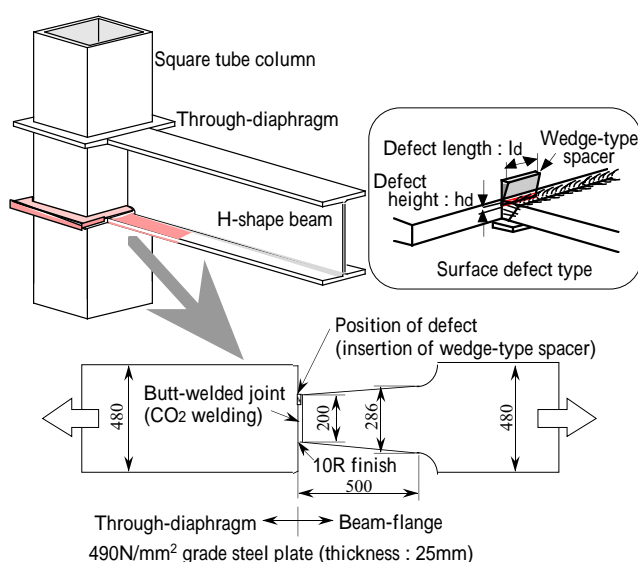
Tension Tests of Welded Joints with Defect
